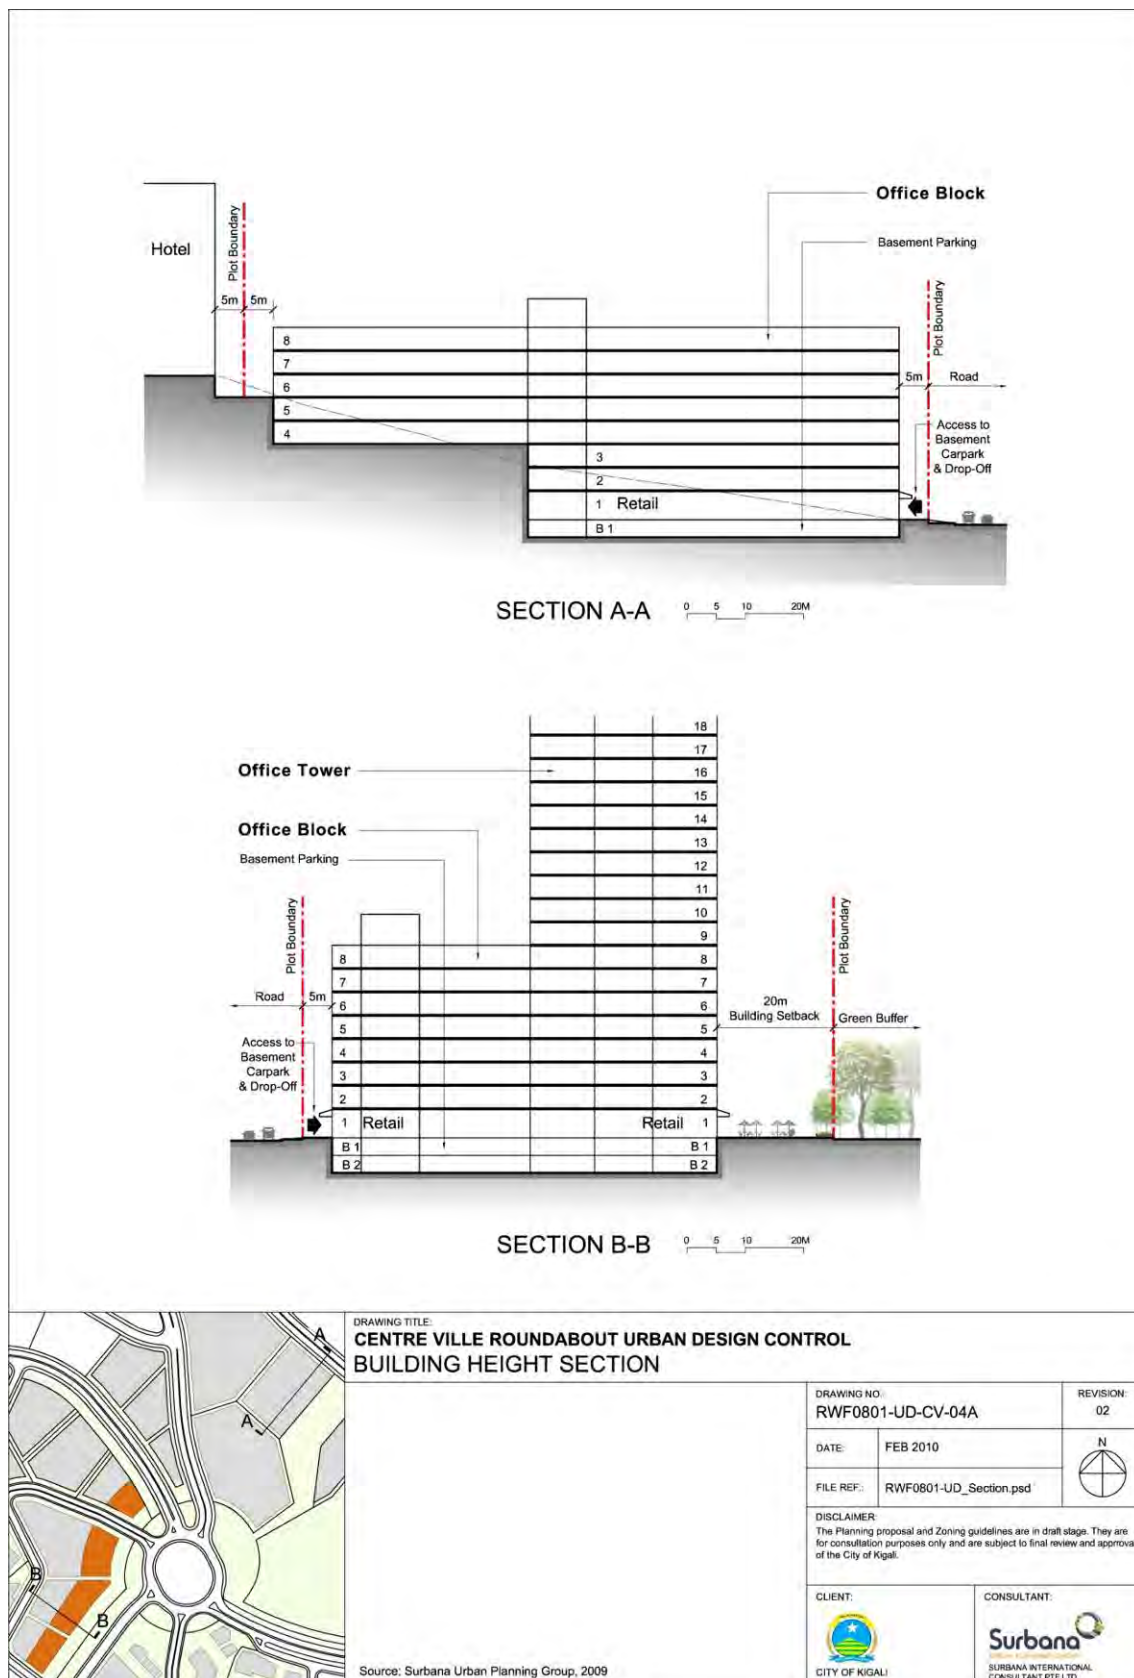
Centre Ville Roundabout Urban Design Control Building Height Section.
